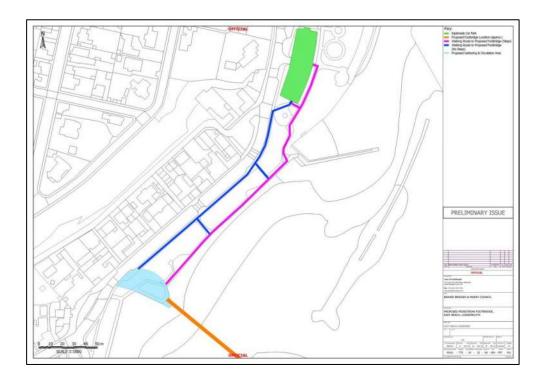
Walking Routes from Esplanade Car Park to Proposed Bridge
